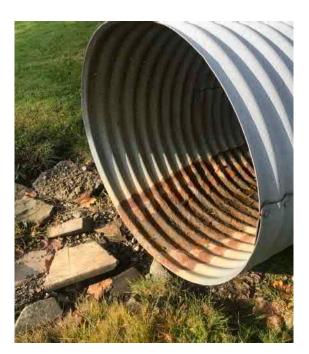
↑ WC-02. Culvert outlet on east side of Glancaster Road
